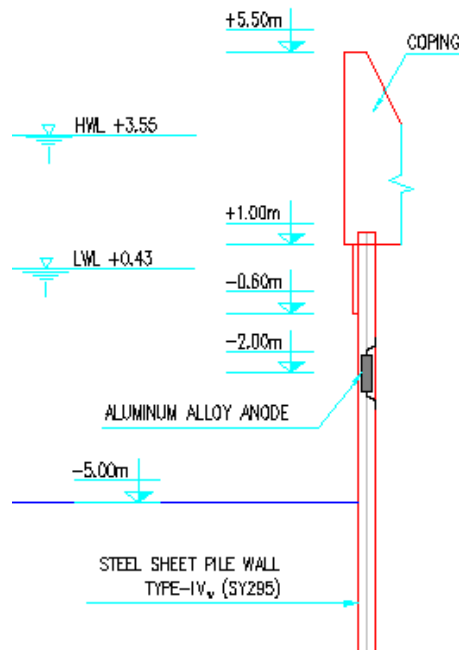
Corrosion Protection of Steel Sheet Pile
